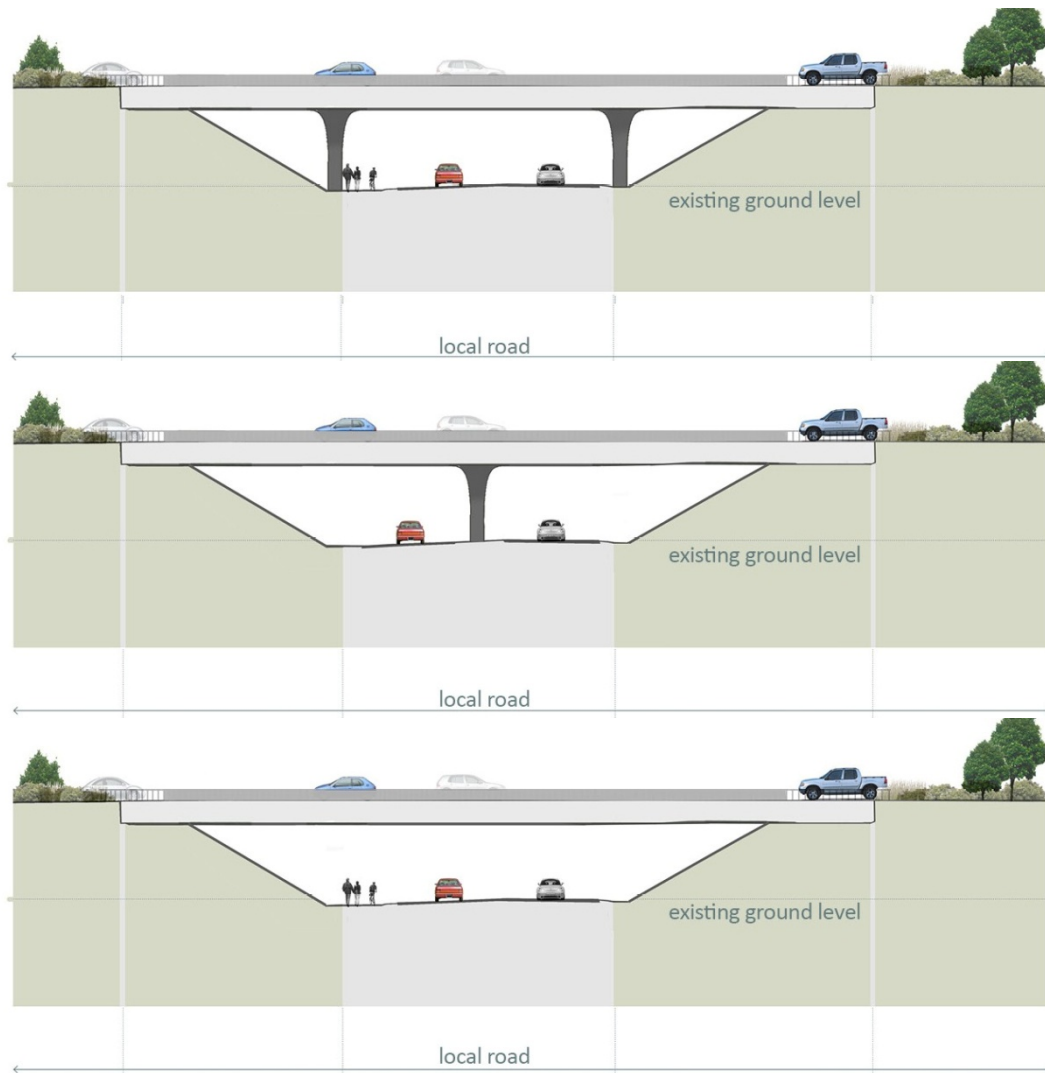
Cross sections of underbridges for local roads (indicative only)
